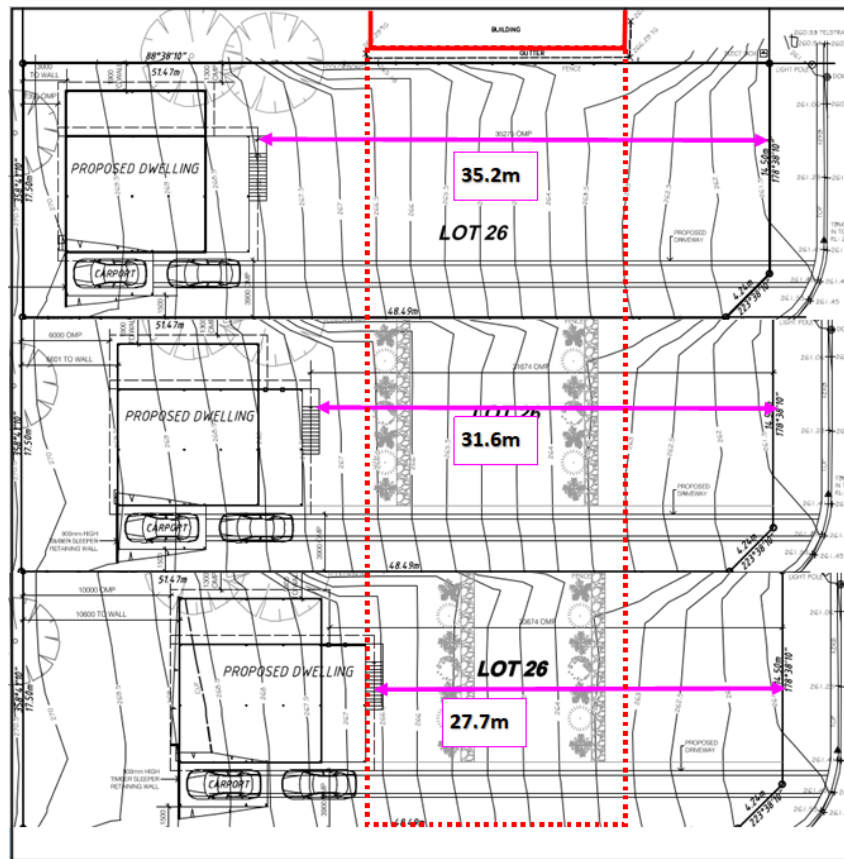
The siting of the proposed dwelling as amended over the course of the assessment (27.7m proposed) and the positioning of the adjacent dwelling front and rear walls at 3 Ekers Court (red dash).
